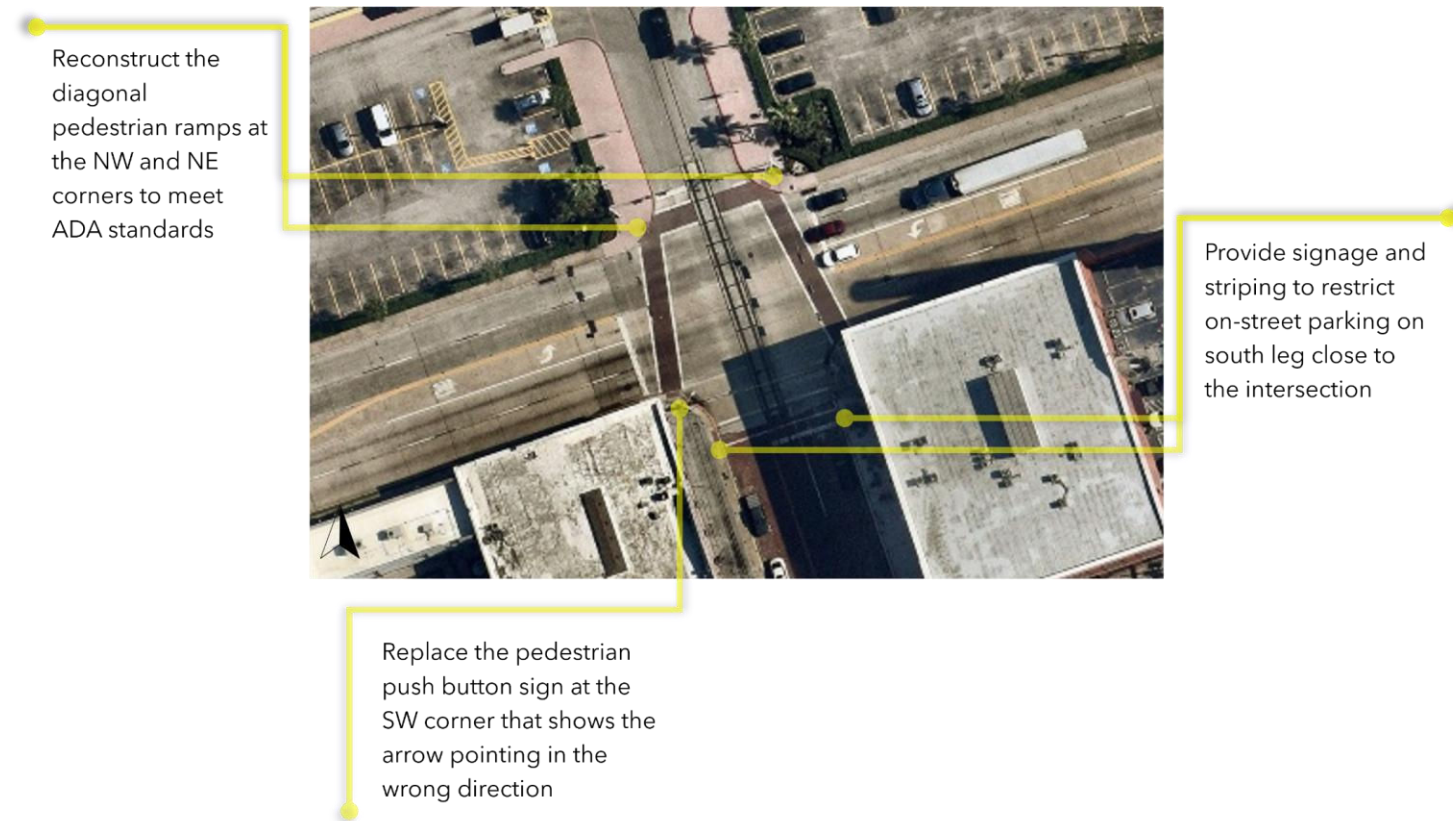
Recommended Improvements to the Intersection of Harborside Drive at 21<sup>st</sup> Street
